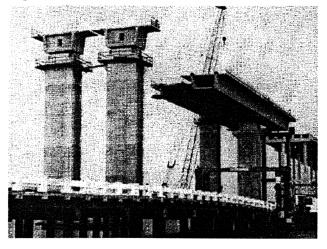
Construction of a precast segmental concrete bridge. (PTI/PCI, 1978)
